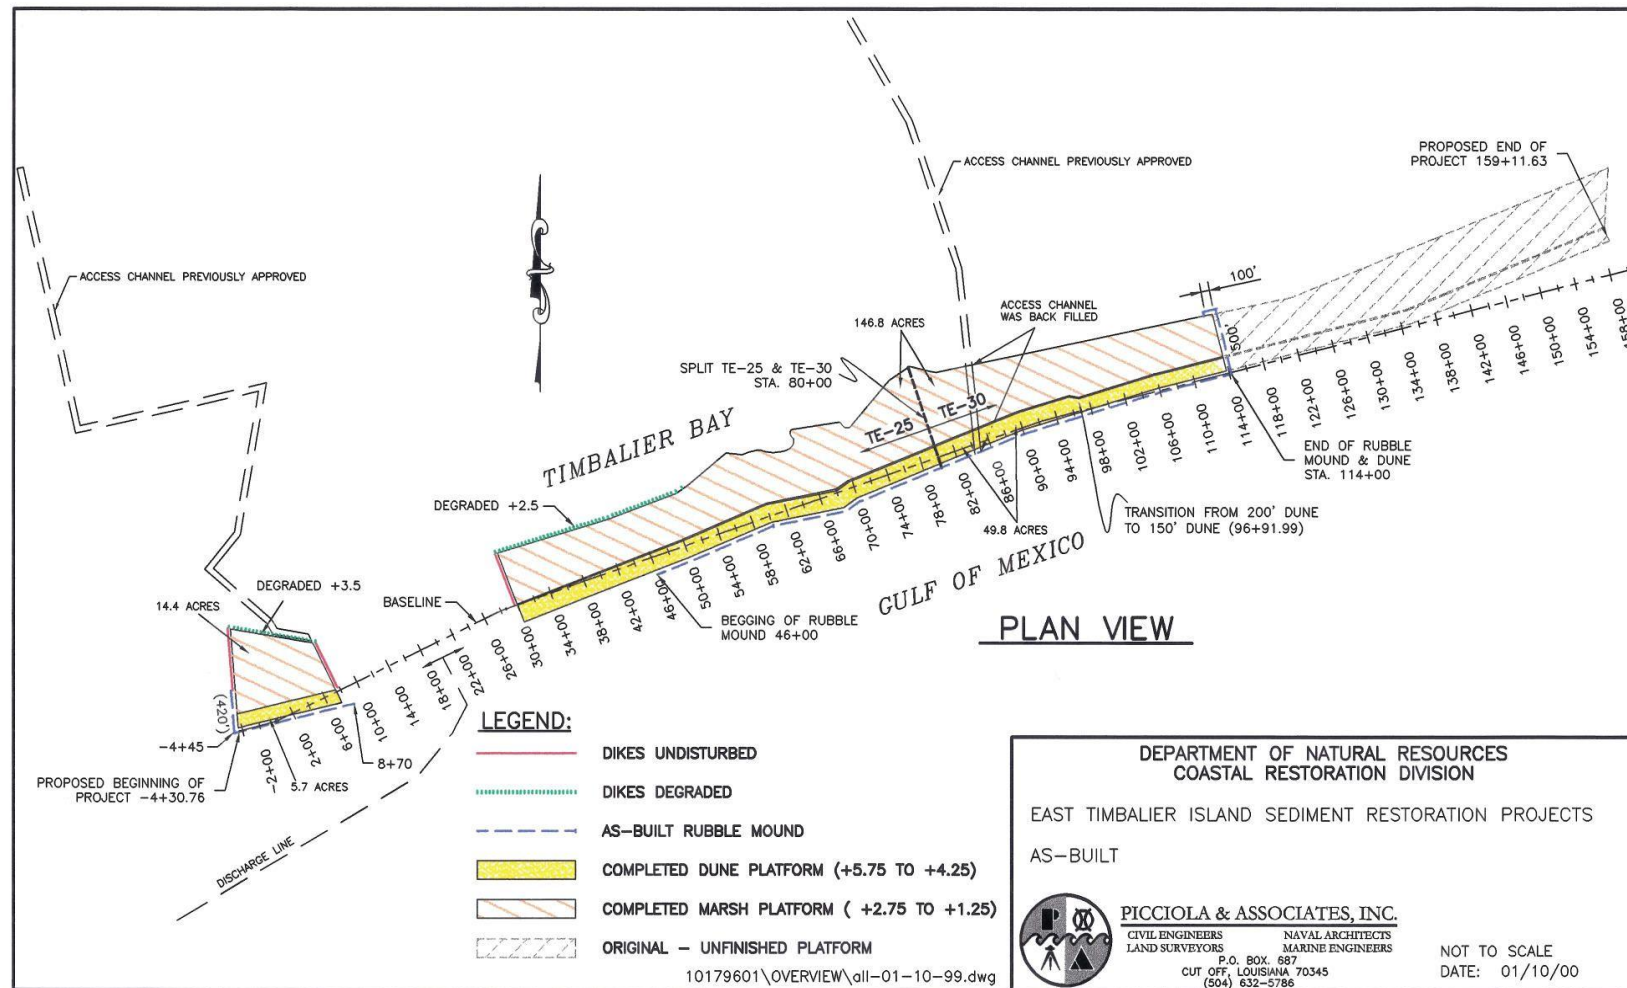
As-built plans for the TE-25 and TE-30 projects.
